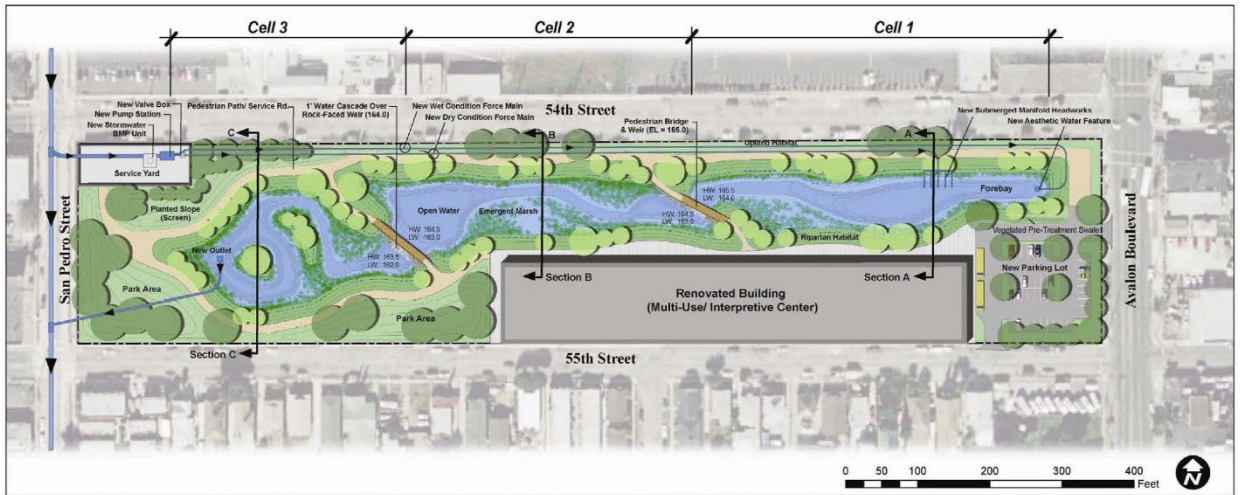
Wetlands Park Site Layout proposal, Source: Draft EIA report, 2007 edited by Author
